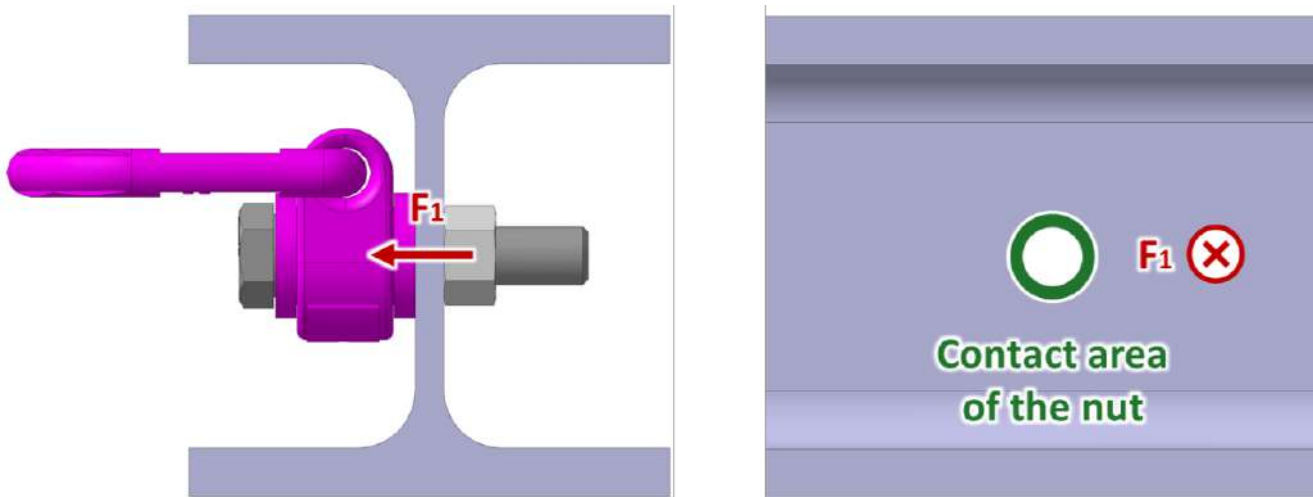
Sideways pulling force acting on the contact area of an M12 nut located in the centre of a false floor level beam.
